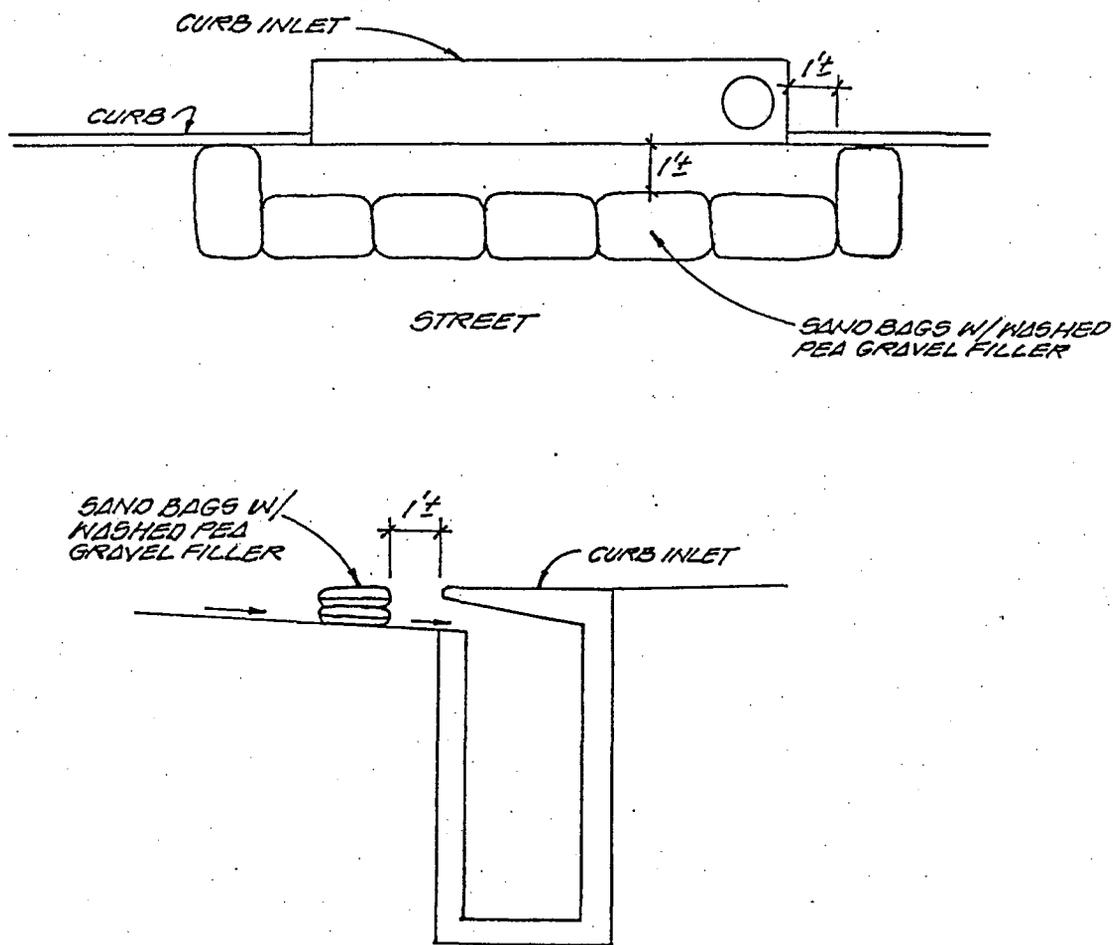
Diagram of Bagged Gravel Curb Inlet Protection (Pape-Dawson)
